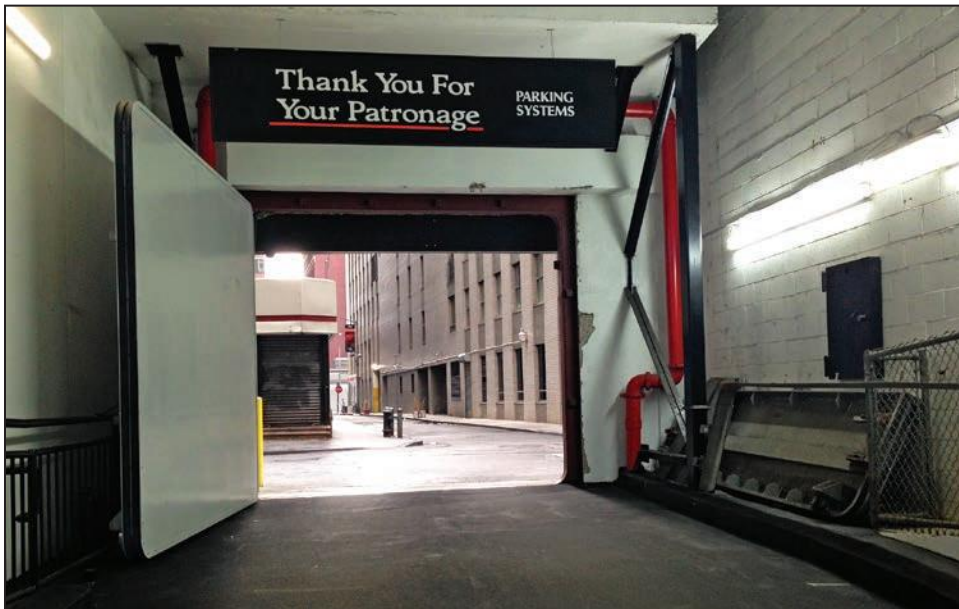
Permanent swing door (deployment requires closing and securing the door)
